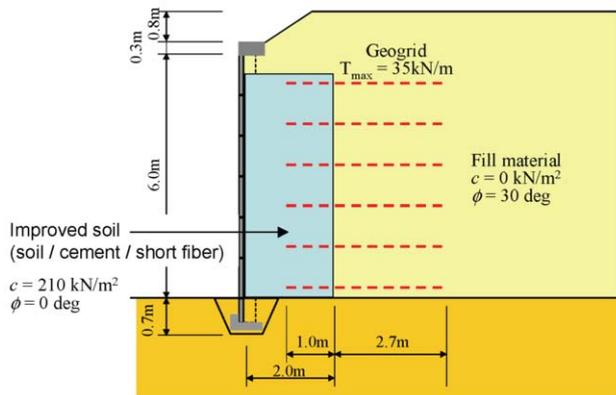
RSW combined with mixing of cement and short fiber. (From Dr.Hirai, member of Japanese Supporting Committee)
